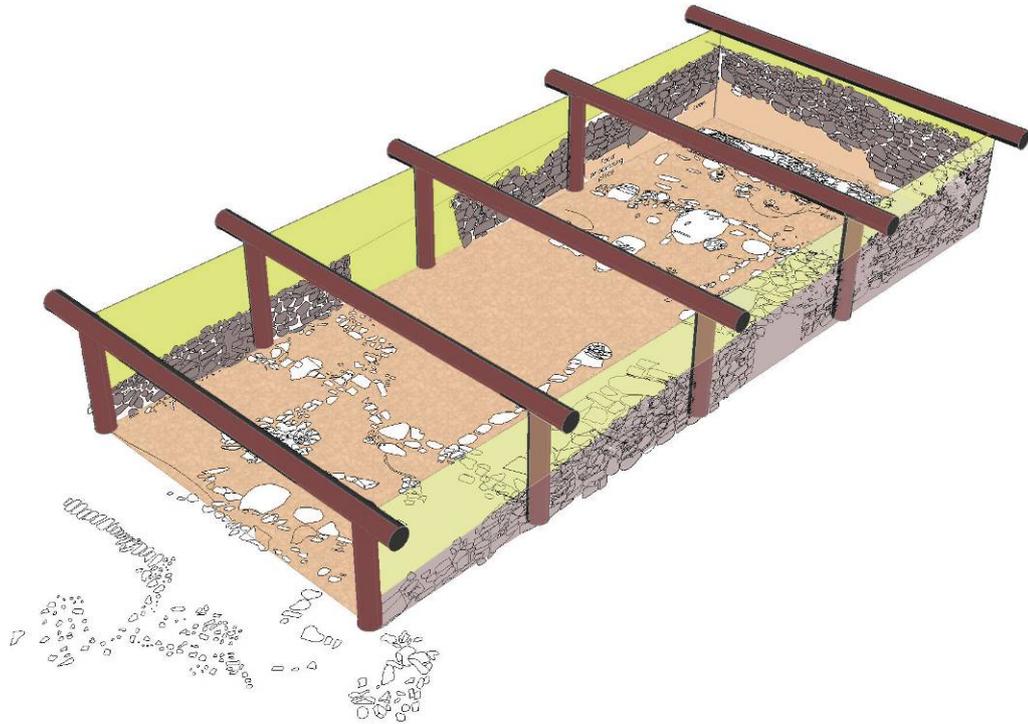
Construction process-step 4: Placement of the lintels supported by the posts: the bearer frame of the roof construction.
